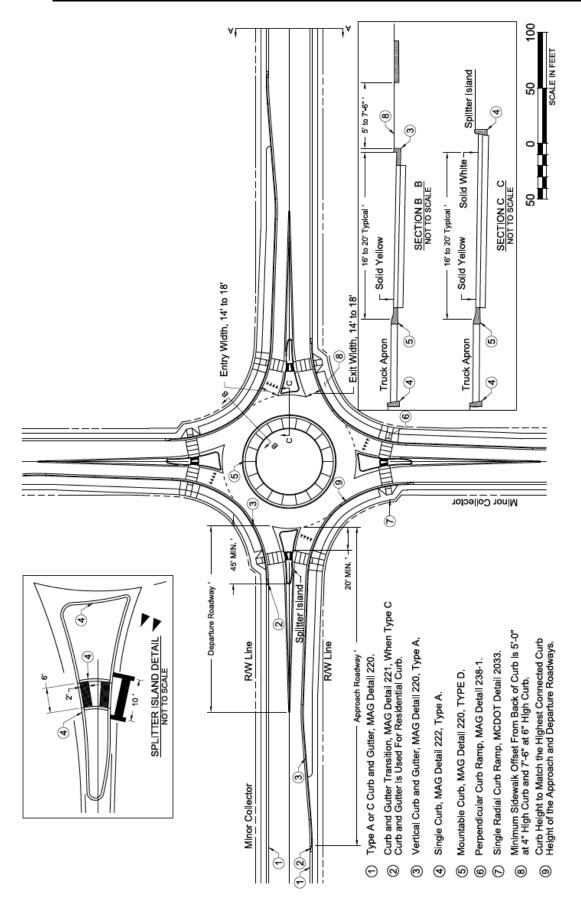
5: URBAN SINGLE-LANE ROUNDABOUT
